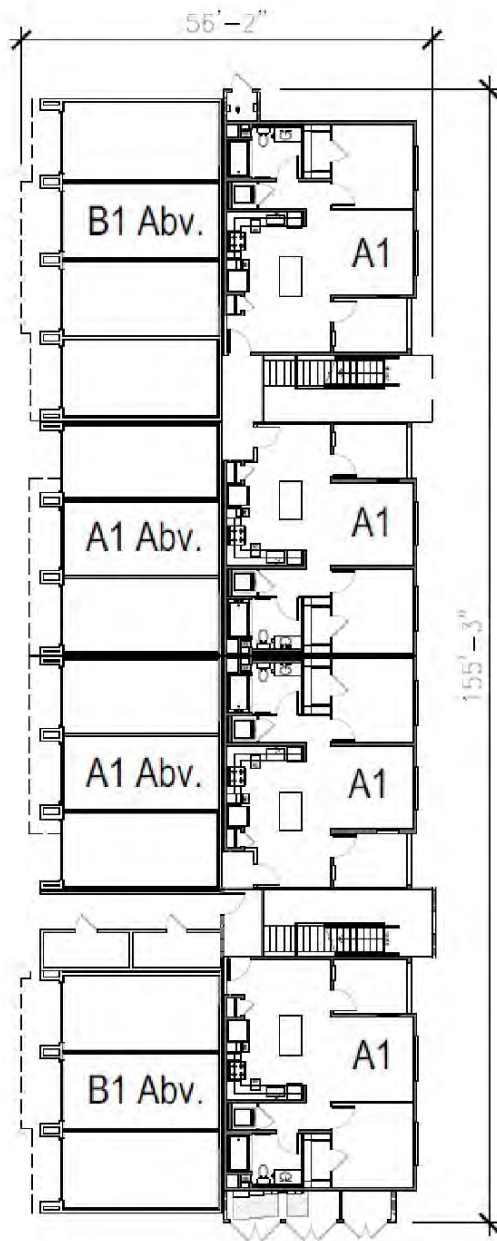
Type D Building 9 - 4th Floor Plan
